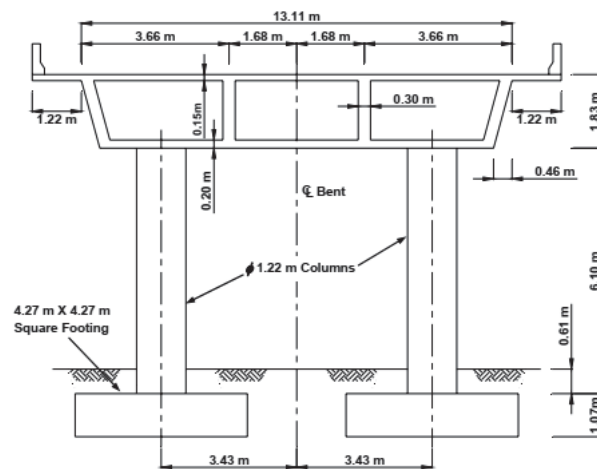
The cross section of the two-columns framed piers in FHWA Bridge #4 of [9].
